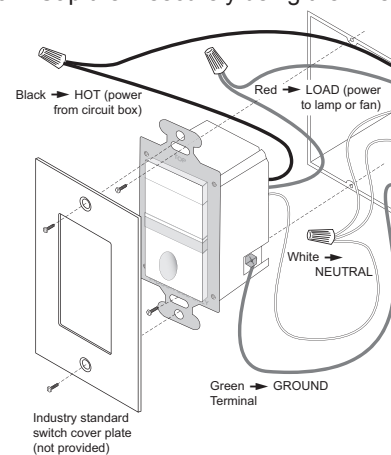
Sensor orientation, wire connections, and wall box assembly
